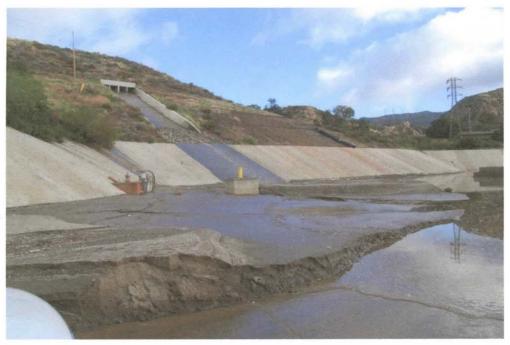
Sediments in Terminal Basin Upstream of Gabion Wall
